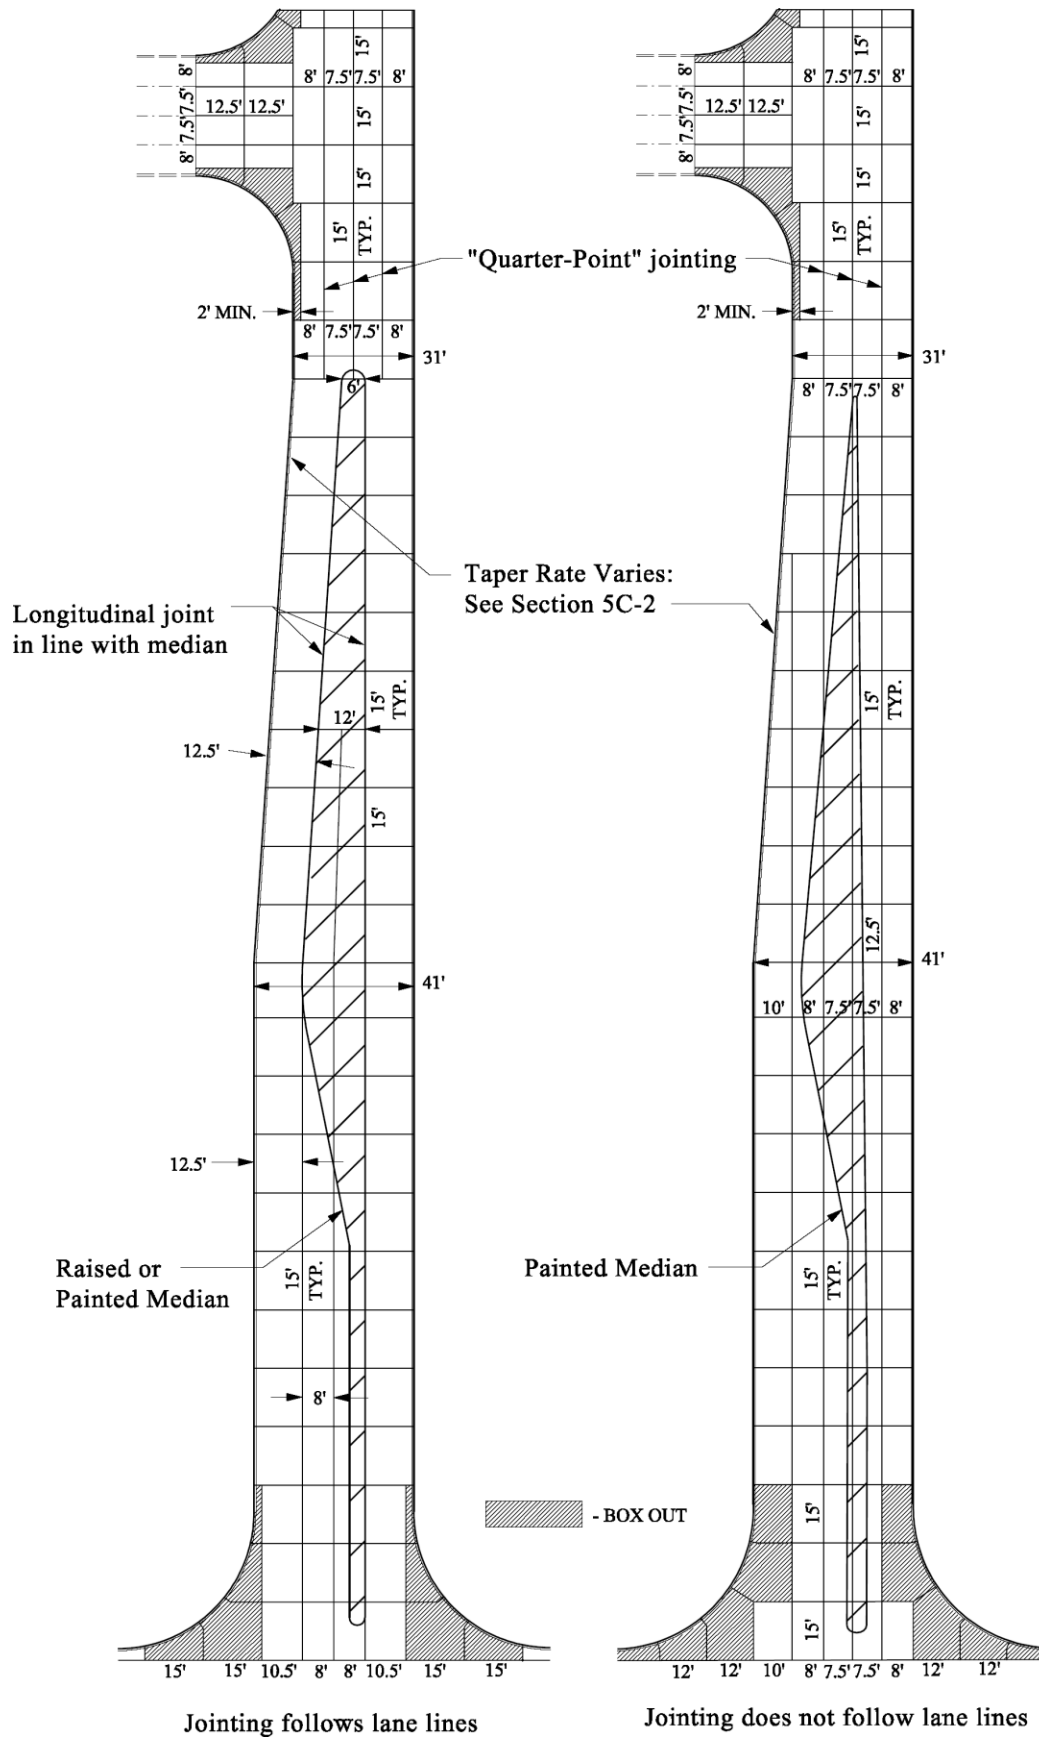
G-3.05: Quarter-Point Jointing - Widening One Side (31 Foot to 41 Foot)
